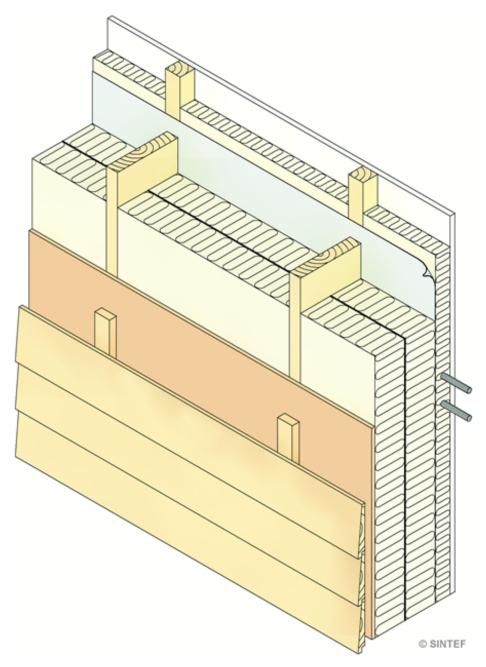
Construction of traditional exterior wall with two-stage seal [27].
